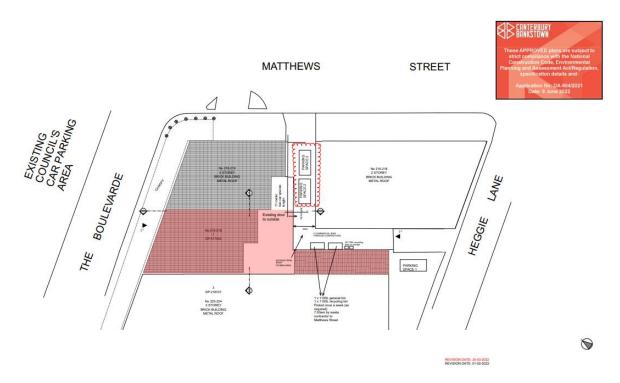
Extract of approved site plan with the location of the premises indicated in red (Source: Premium Design and Engineering, 2022).
